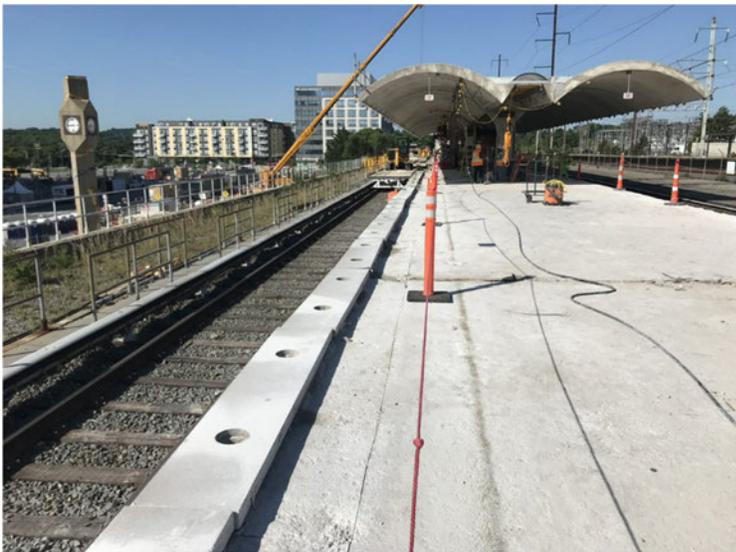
New Carrollton Station having similar construction performed with newly implemented safety barricading.
